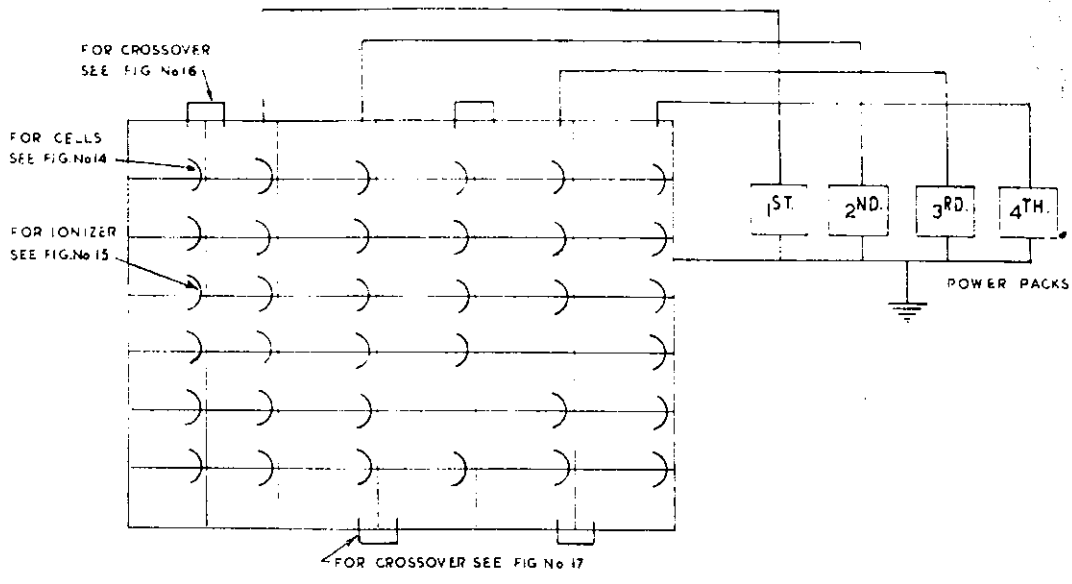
High Voltage Wiring Layout of Frame Arrangement for P.S.G./P.S.A. 7024
